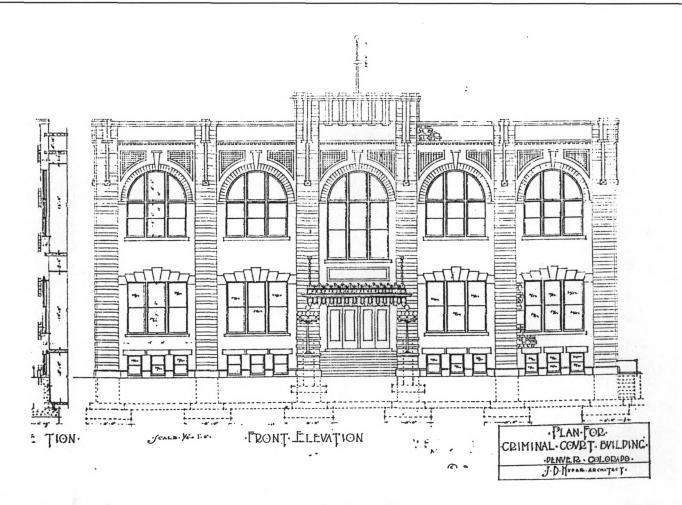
Front elevation for "Criminal Court Building" by James Hyder. The final building design does match the drawing in a number of areas, including the second-floor window pattern, window surrounds, spandrels and parapet detailing. (Source: Denver Public Works Department as reprinted in *Westside Court Building Feasibility Study*.)
